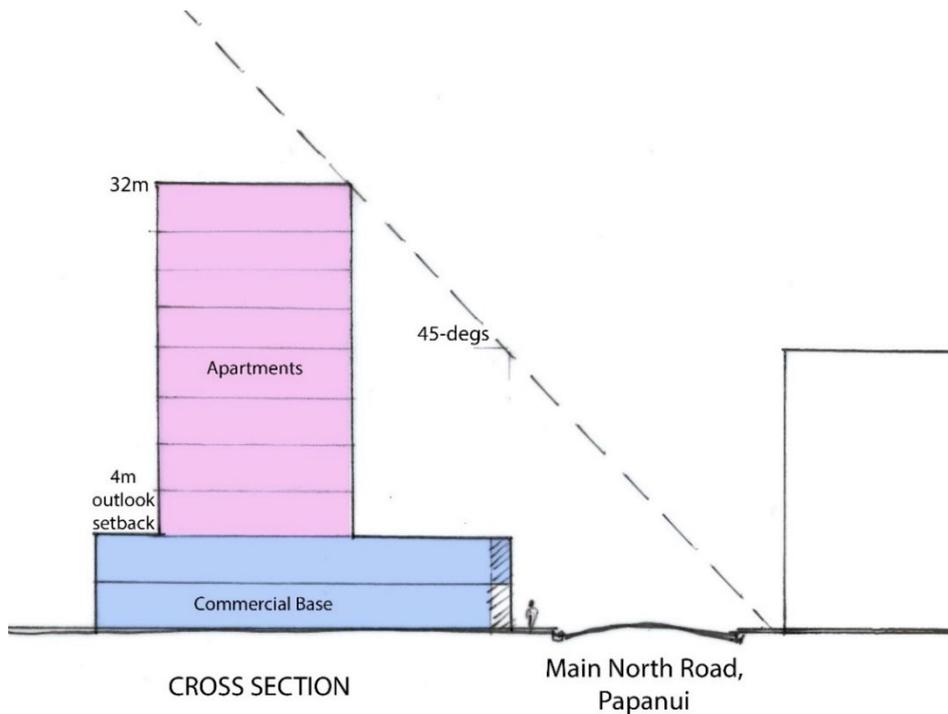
Another potential cross section of a two storey base and an eight storey tower up to 32 metres. Permitted activities for residential (P21) states residential shall be located above the ground level so a commercial ground floor and 9 storey apartment building above would also be permitted.
